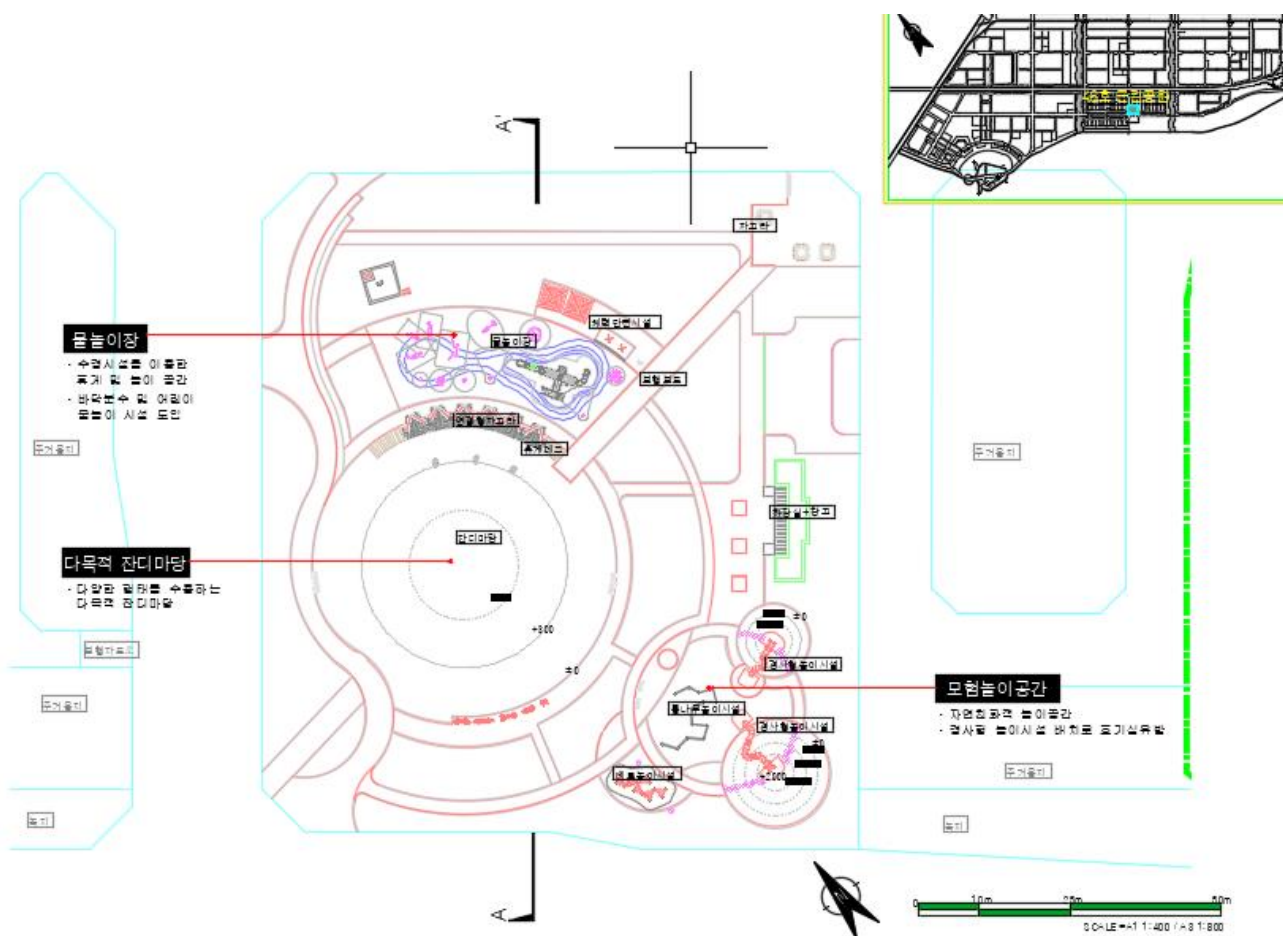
No. 46 Neighborhood Park Location and Floor Plan
